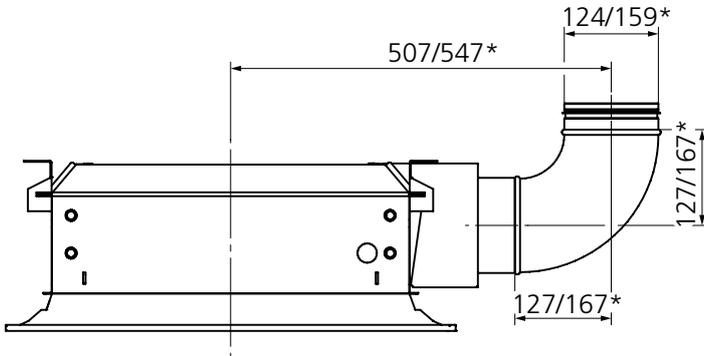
Dimensional drawing, long side connection with bend Ø125/160
